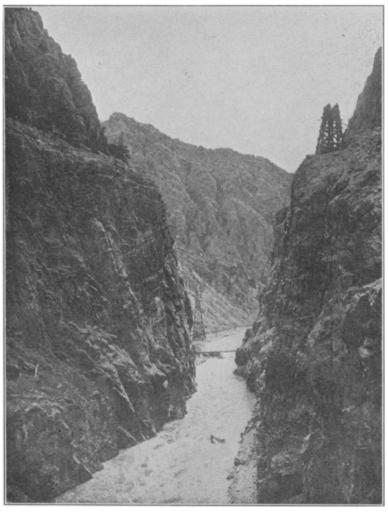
PLATE VIII.—Site of Shoshone Dam, Wyoming, looking up-stream. Under construction. Height from foundation to coping 310 feet. It will be the highest dam in the world.
